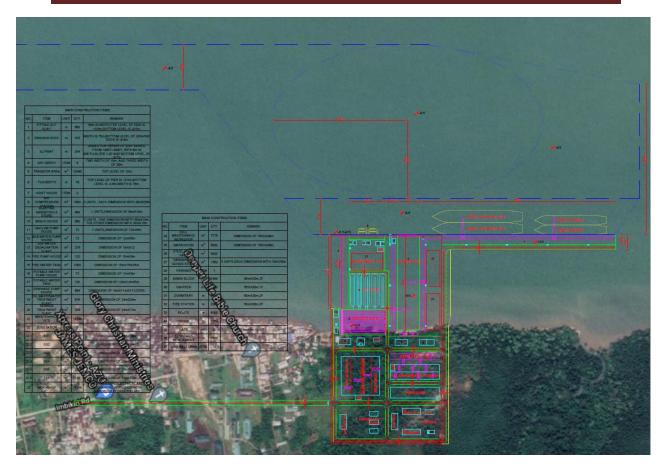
General Layout for the Proposed Brass Shipyard Project
